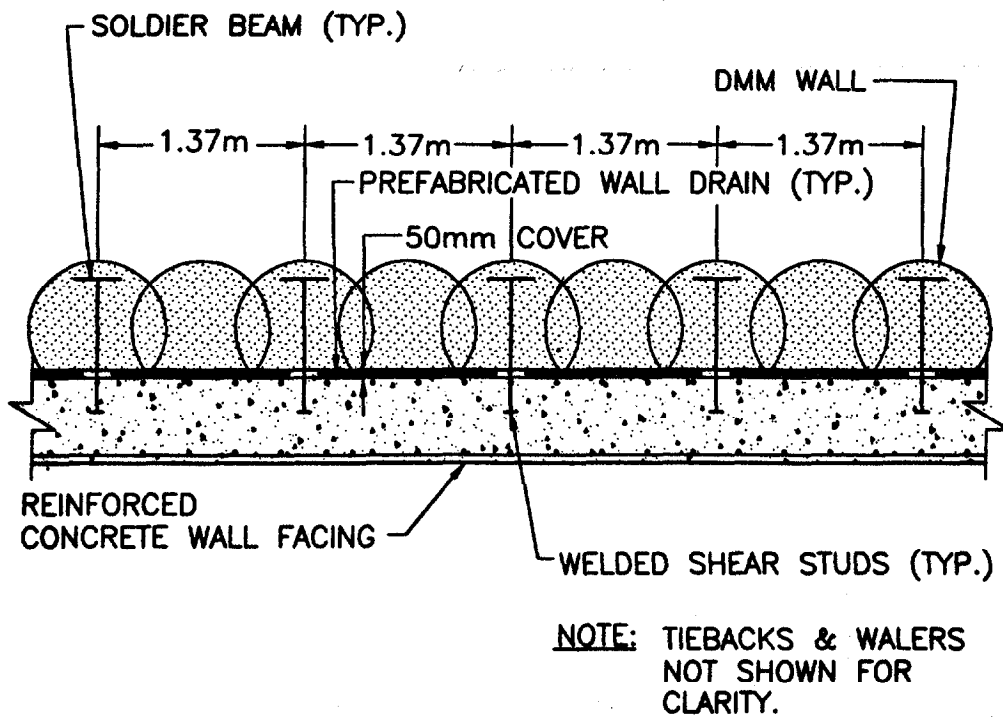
Plan view, DSM wall, concrete facing and tieback anchors, Lake Parkway, Milwaukee, WI (Bahner and Naguib, 1998).
